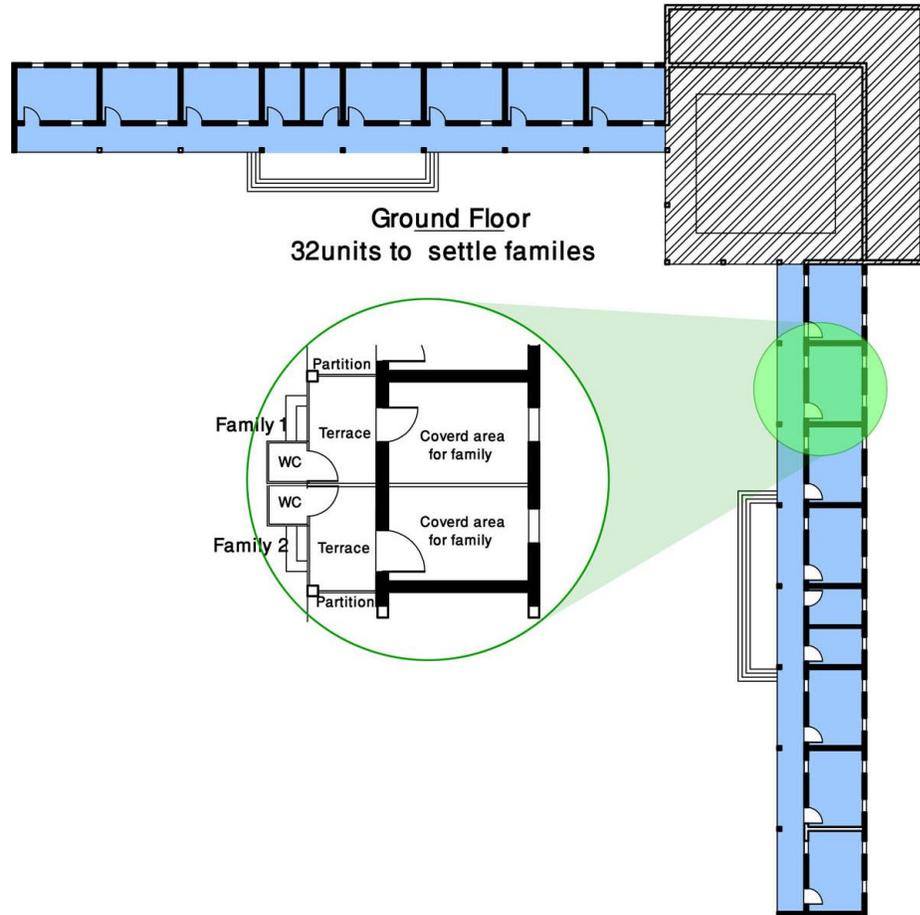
The Proposed Layout of FuwwahSchoolShelter
